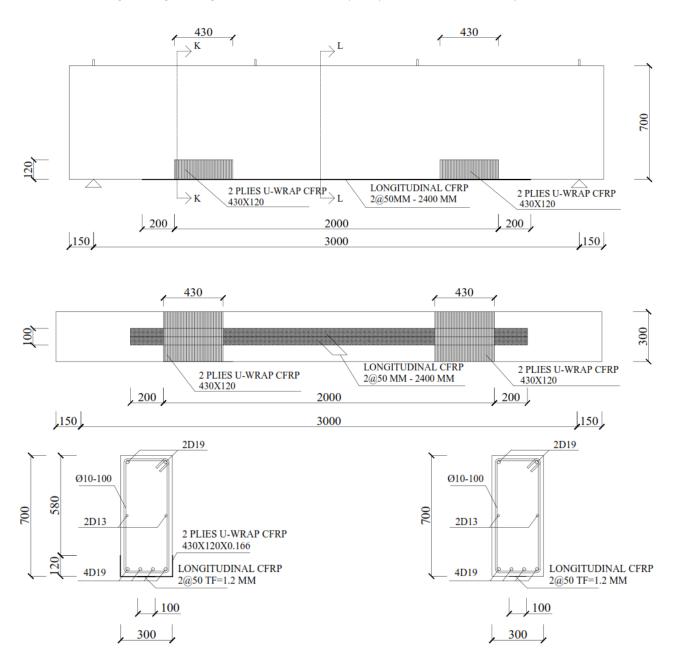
Cross section of BU-700 beam; (a) Details of Installation Placement of *Longitudinal* FRP and FRP *U-Wrap*, (b) Detail of Cross-section with FRP *Longitudinal* and FRP *U-Wrap
